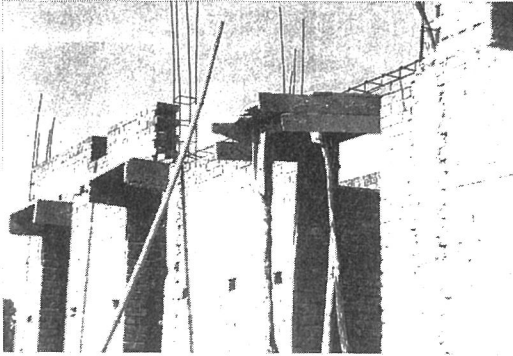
A reinforced concrete building under construction in Bihar State, India
